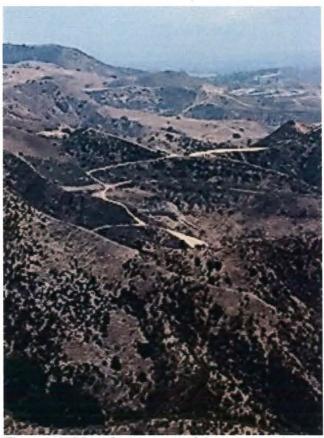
View facing east of the new road construction. Along the top of the road is a bulldozer.
